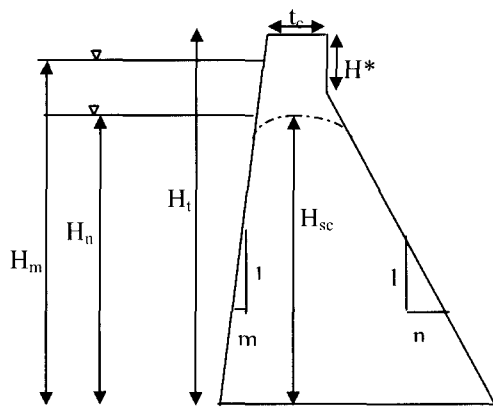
Cross-sectional Layout of the Concrete Gravity Dam
